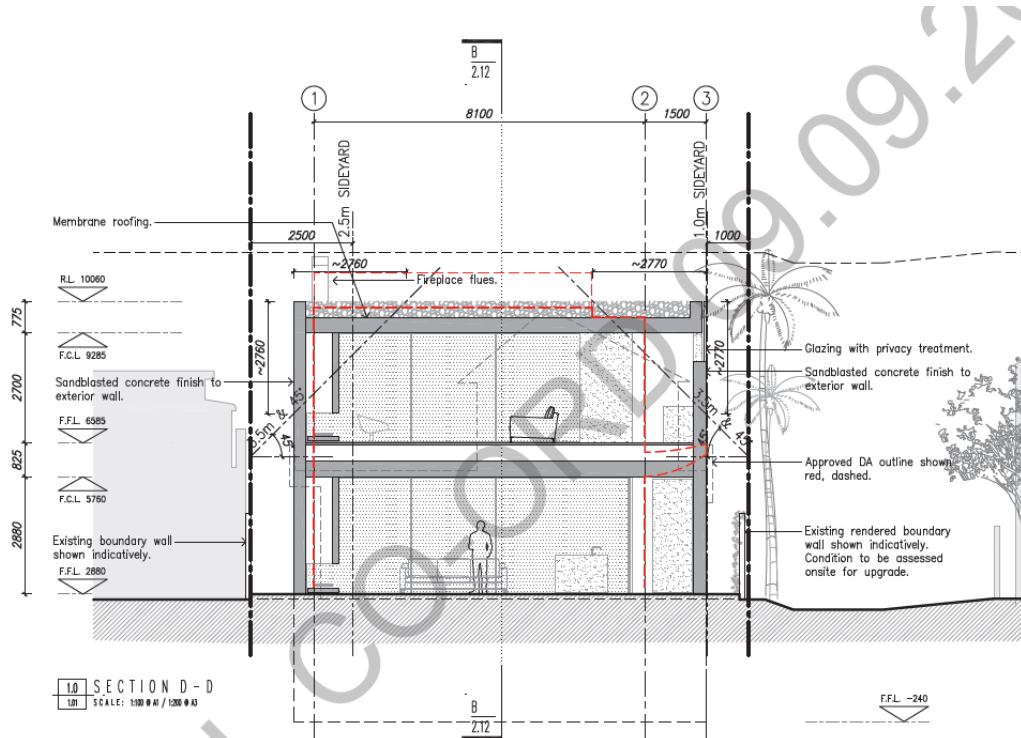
Extract of Section D-D prepared by Fearon Hay Architects
